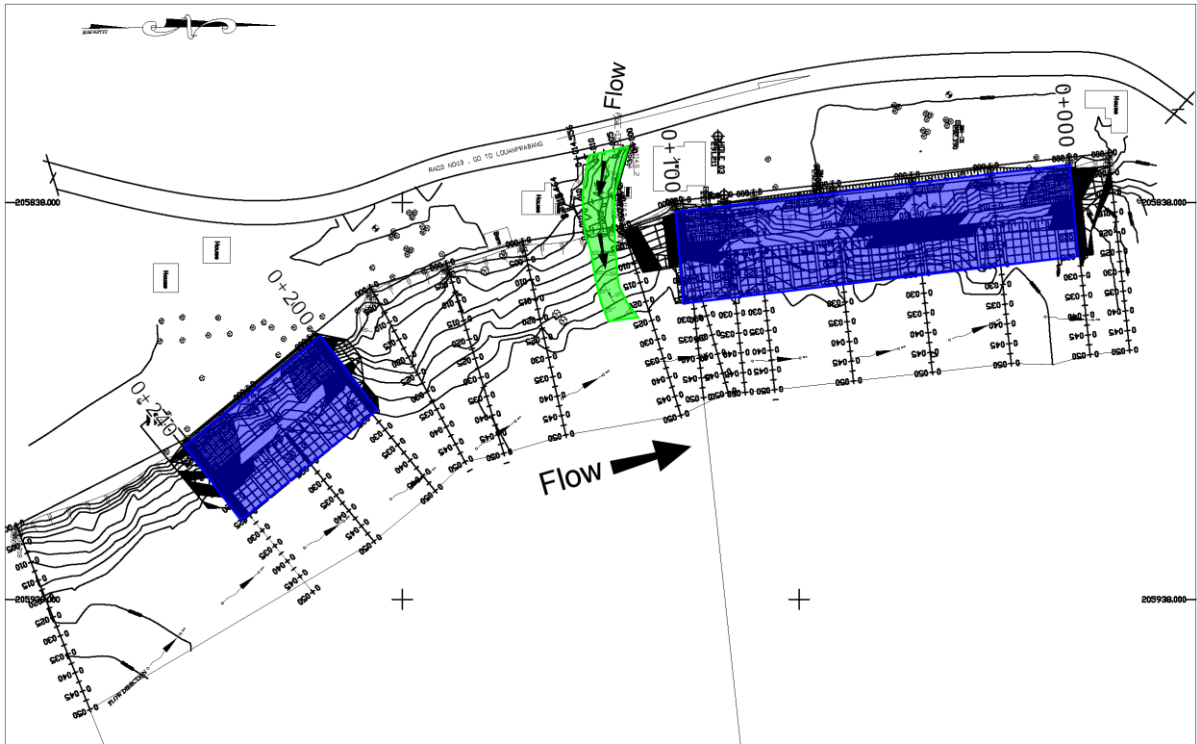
Layout of Riverbank Protection Works at Souanlouang (Nasa) Site
